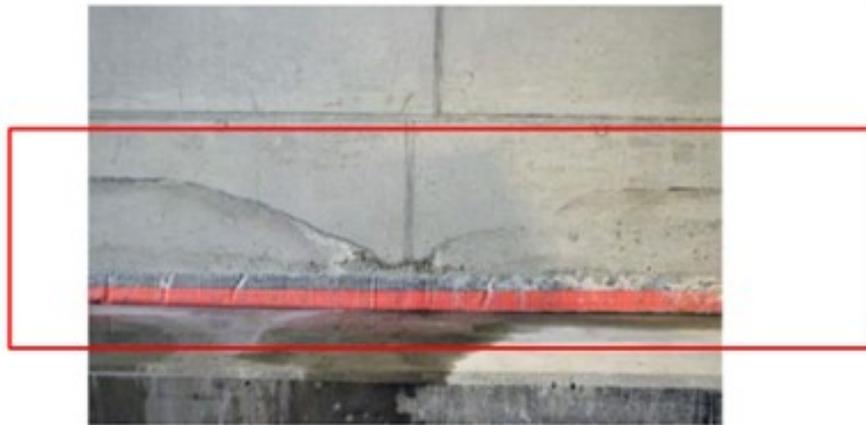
The caisson after formwork removal (SKB TR-20-09)
